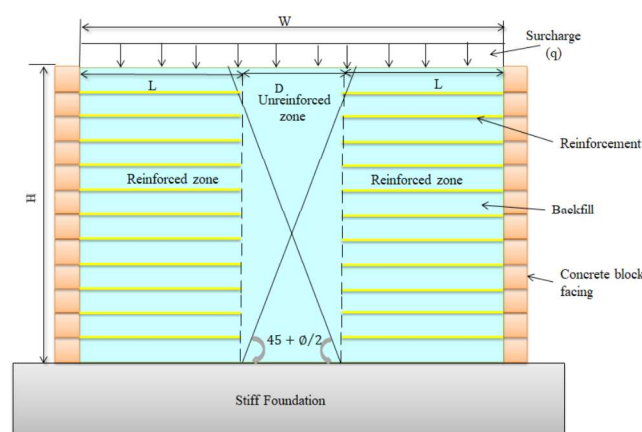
Schematic of BBMSEW (Back to Back Mechanically Stabilized Earth Wall).
